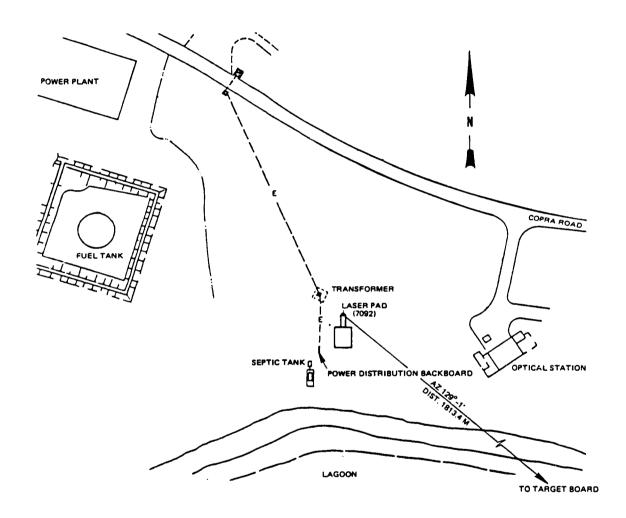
KWAJLN. KWAJALEIN Site Sketch
